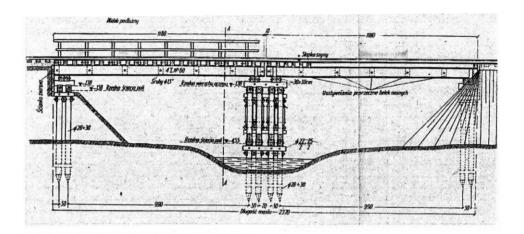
Provisionally reconstructed viaduct (Cholewo & Sznurowski, 1970): left span made of steel I-sections; right span made of wooden beams; central pillar of frame construction set on the foundation of the destroyed abutment
